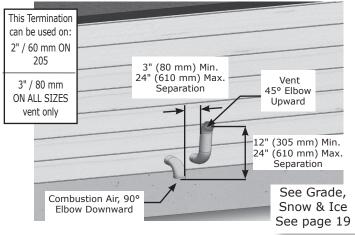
Horizontal Twin Pipe, Exhaust and Intake
